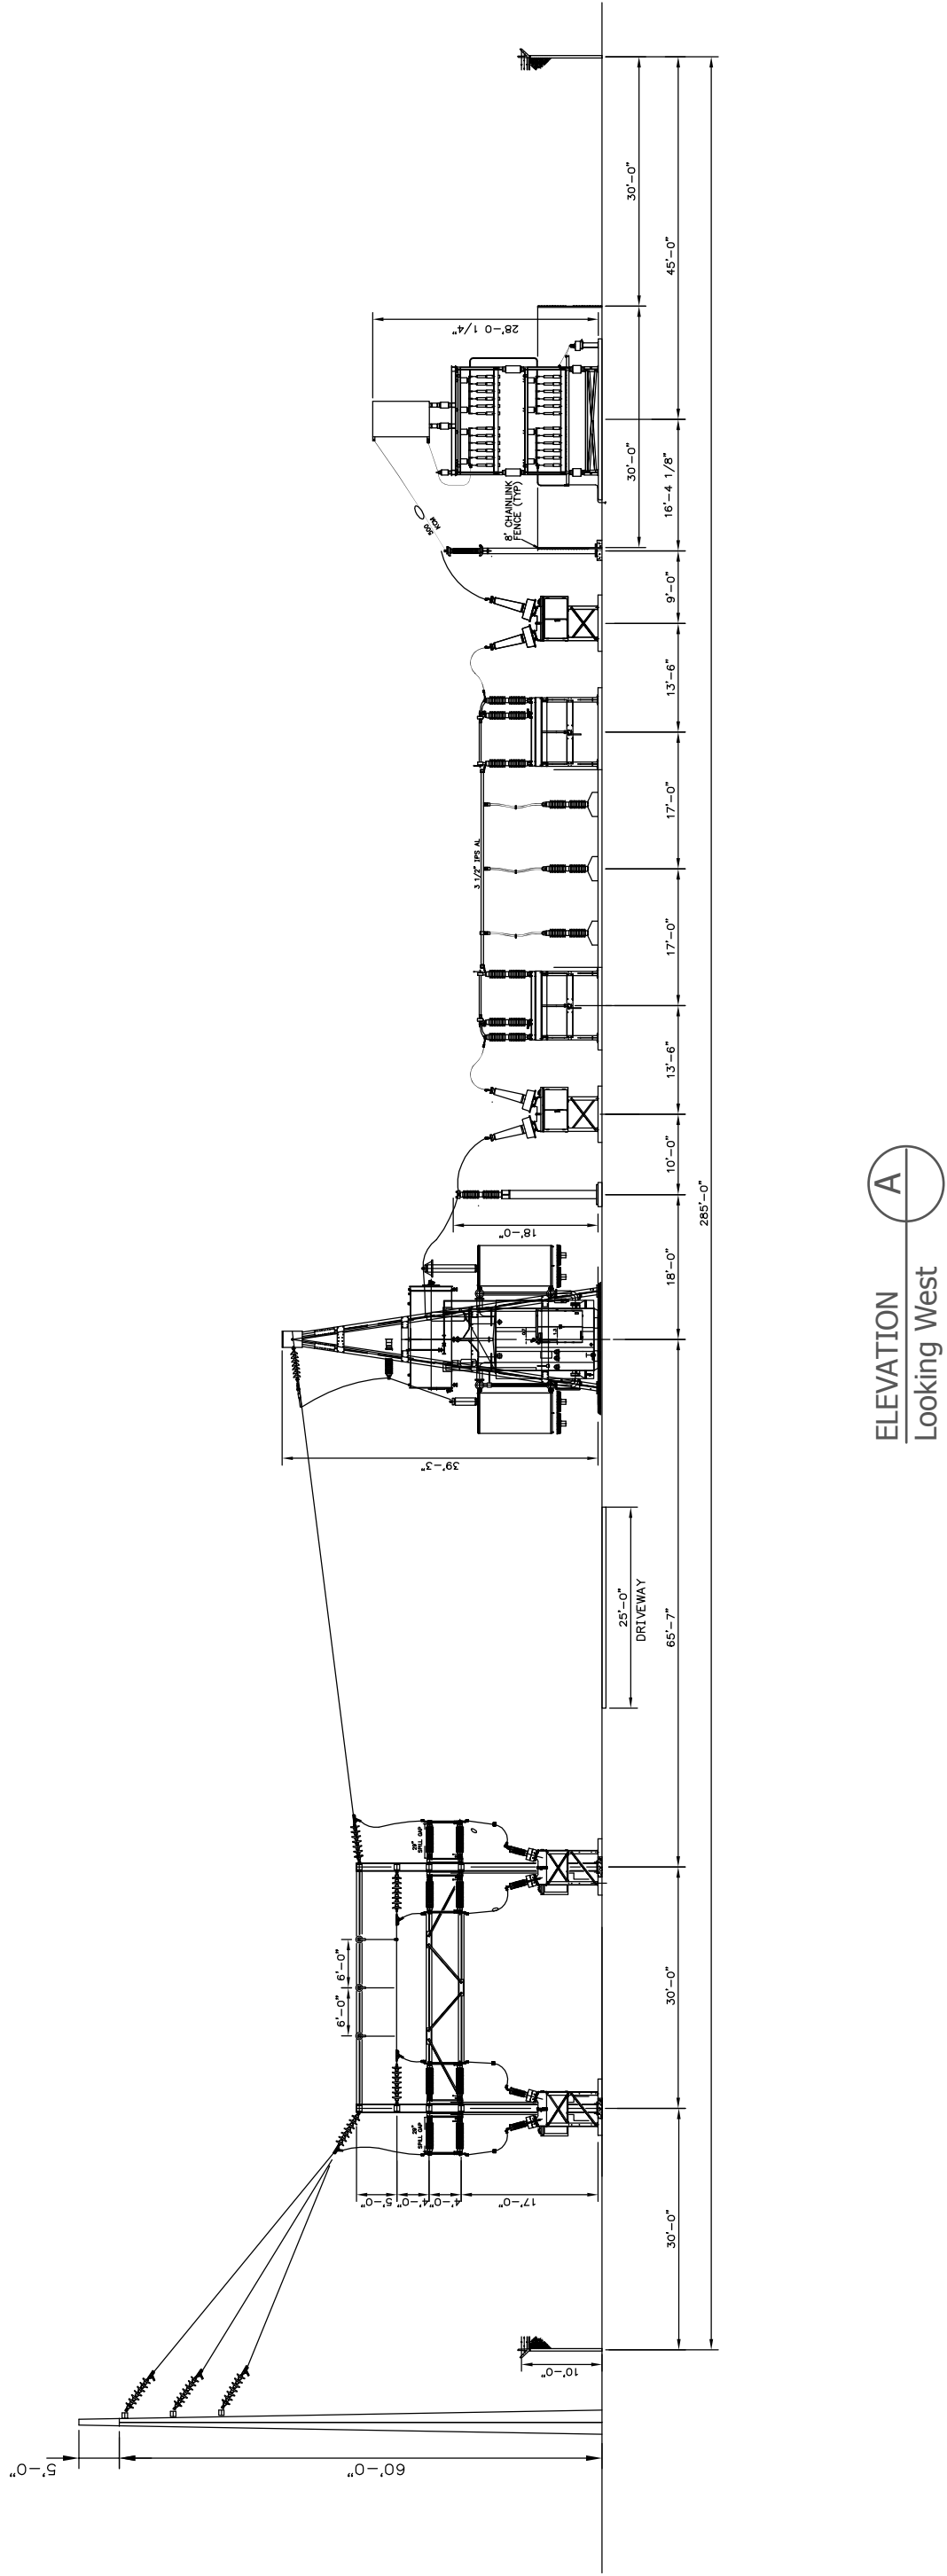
Boulevard Substation Rebuild Profile Drawing
